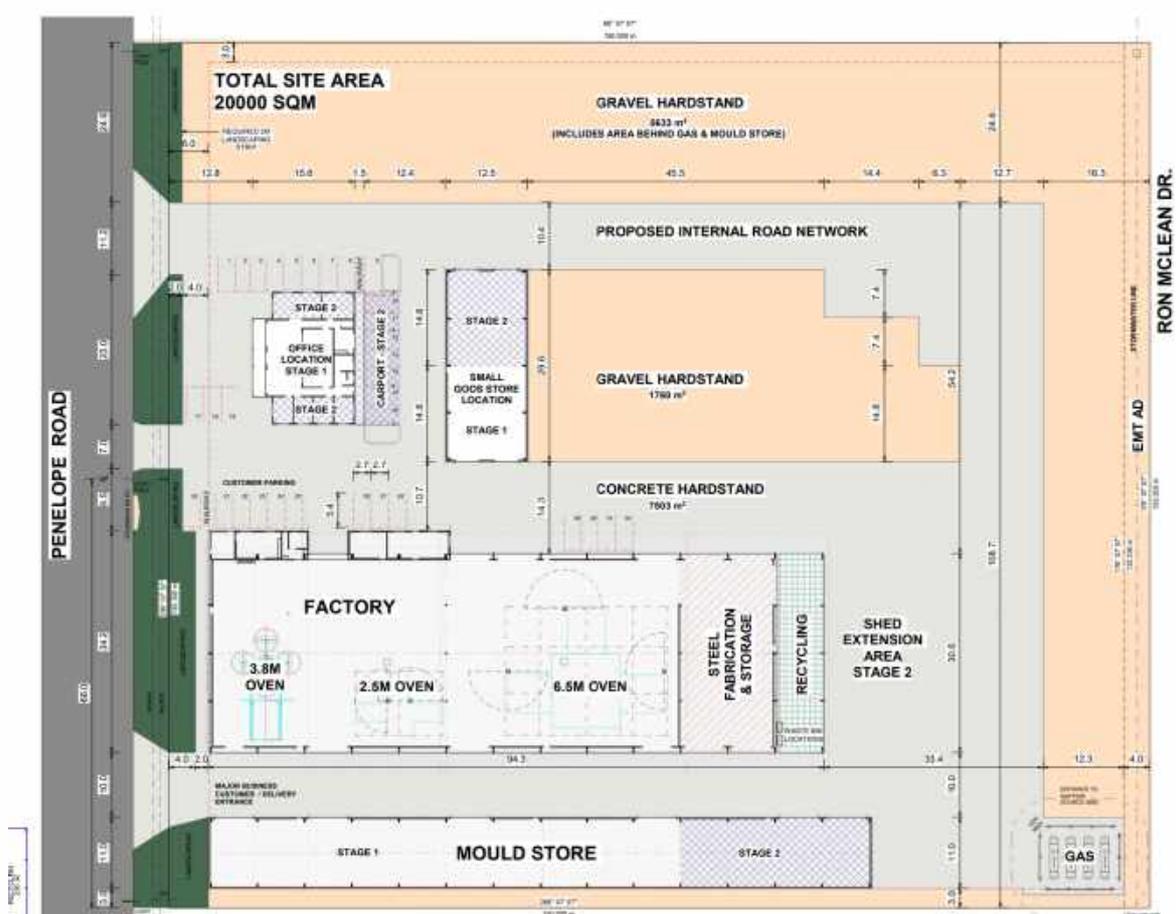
Development Site Layout (Source: Proposal Plans prepared by GVD Building Design)
